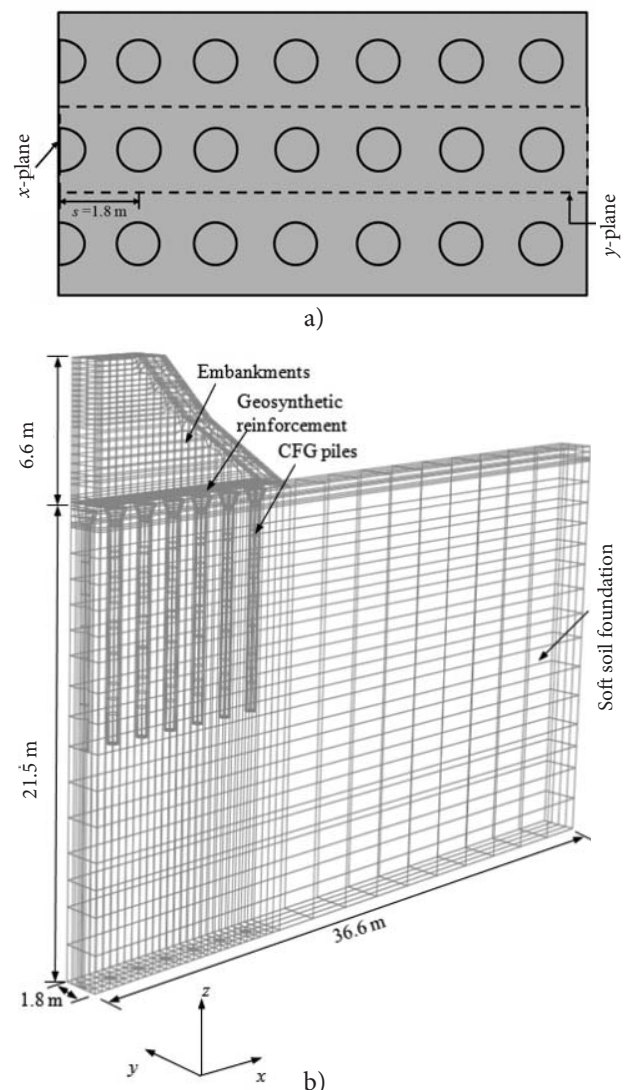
Three-dimensional finite-element model of the embankment: (a) Plan view for layout of CFG piles; (b) 3-dimensional finite-element model.
